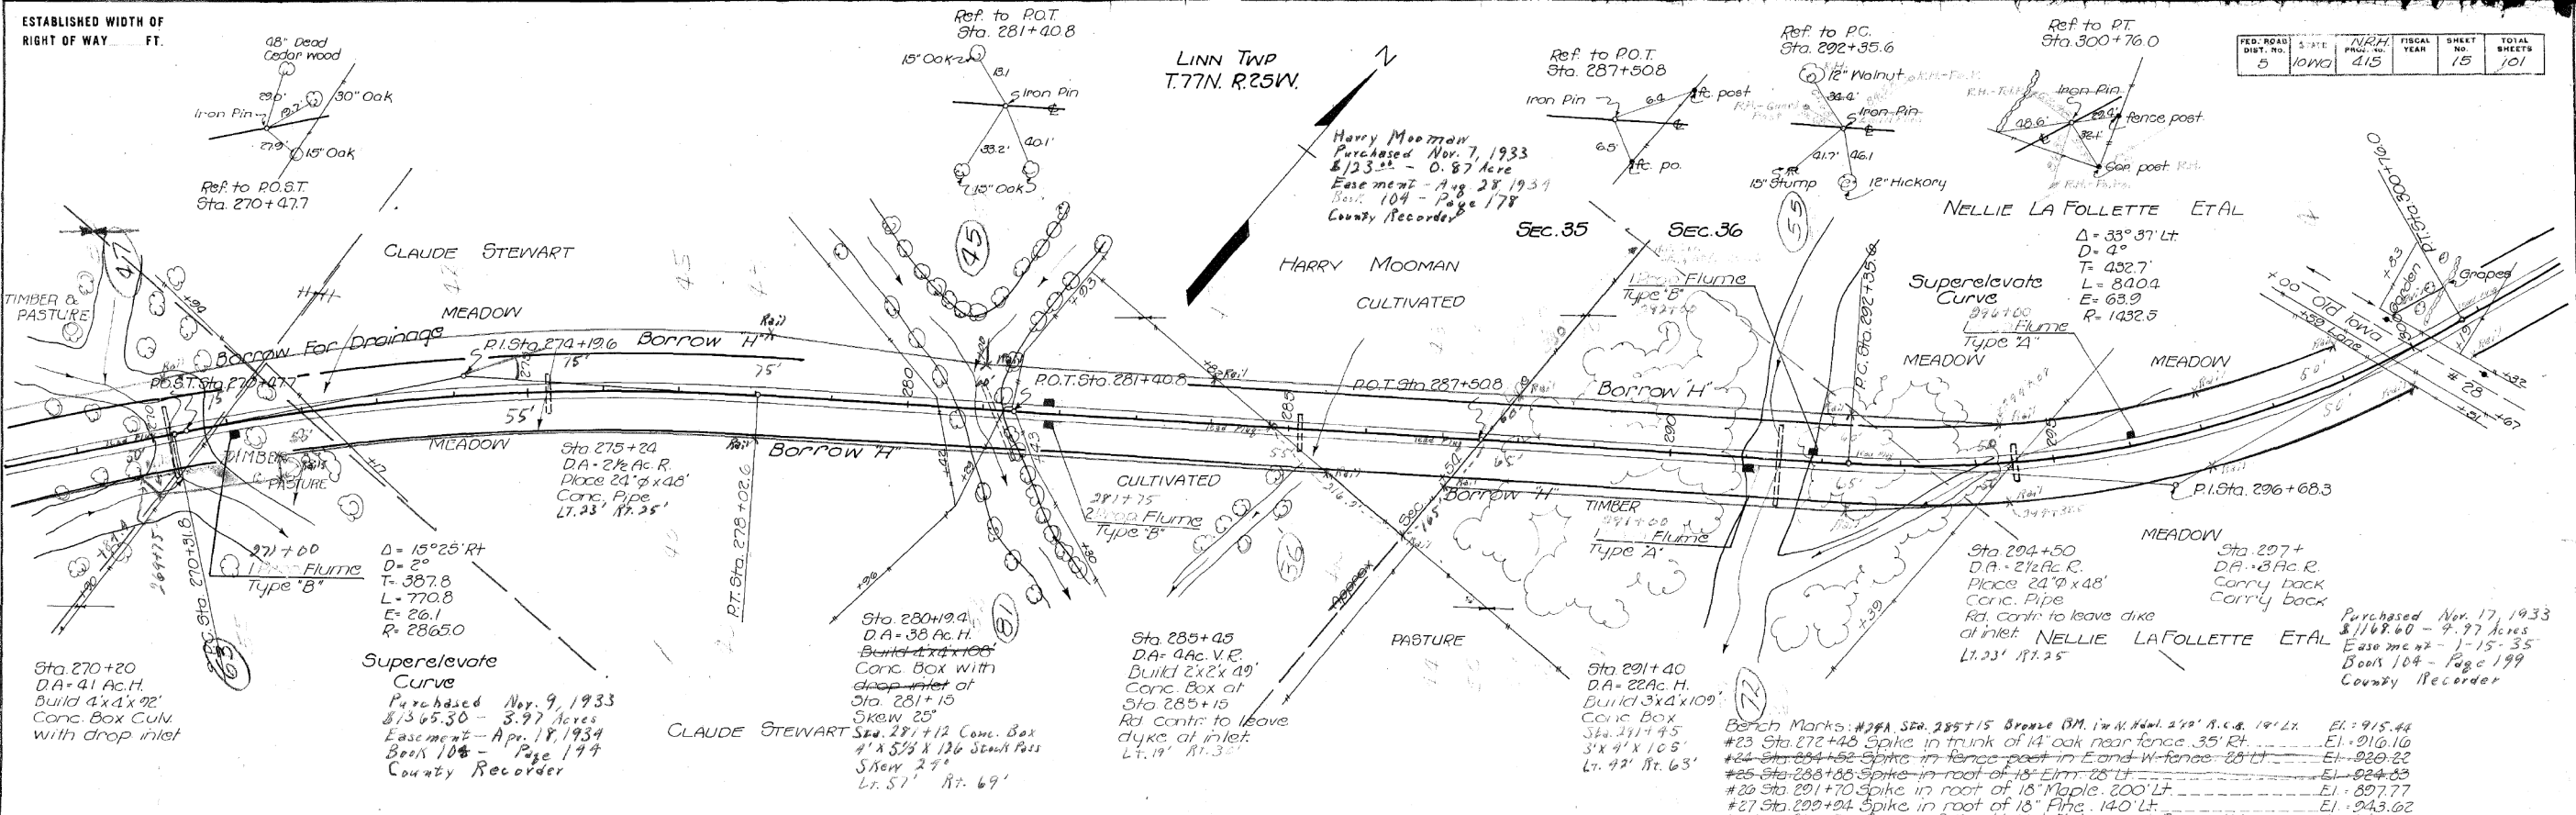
PLAN PROFILE B. P. R. STANBARD Warren County NRH, Proj. # 415 Sheet # 15
